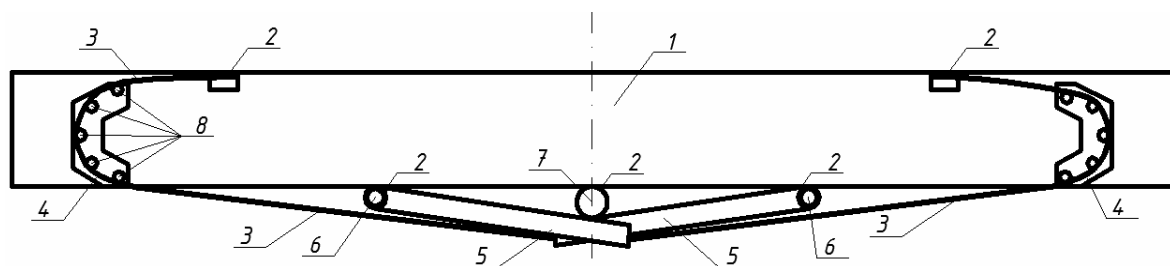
Scheme of the beam with the proposed regulated structure of strengthening with external bars with levers, БП-I - БП-VI series:
